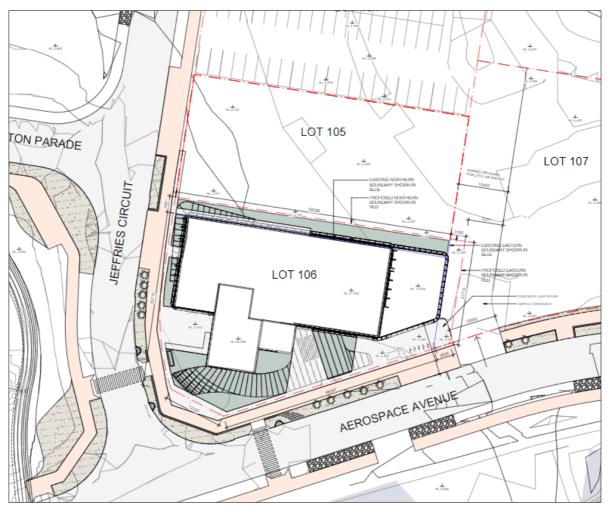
Extract of Site Plan (Dwg No. A-DA-1002) Source: Cox Architects September 2022
